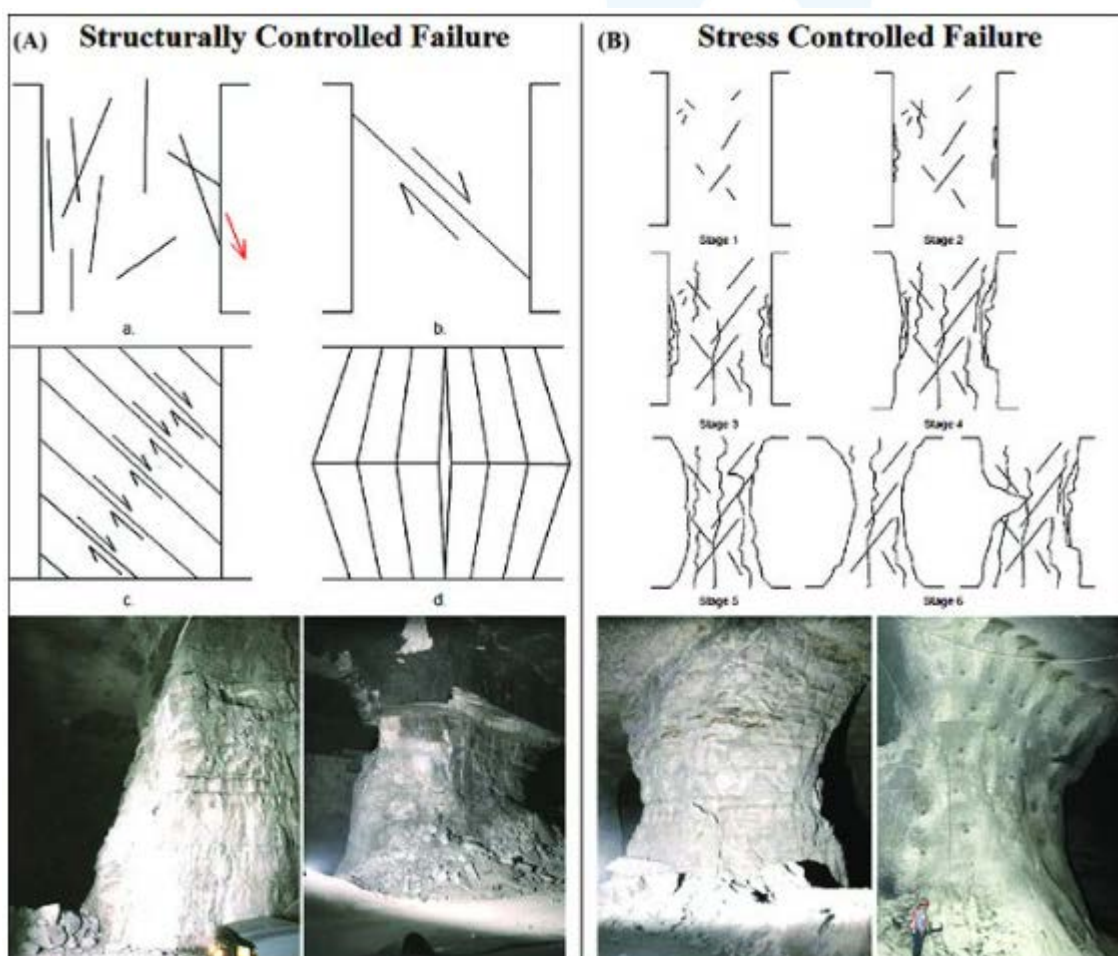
Pilar failures: a) structurally controlled failure, b) Stress controlled failure (Monsalve et al. 2020).
